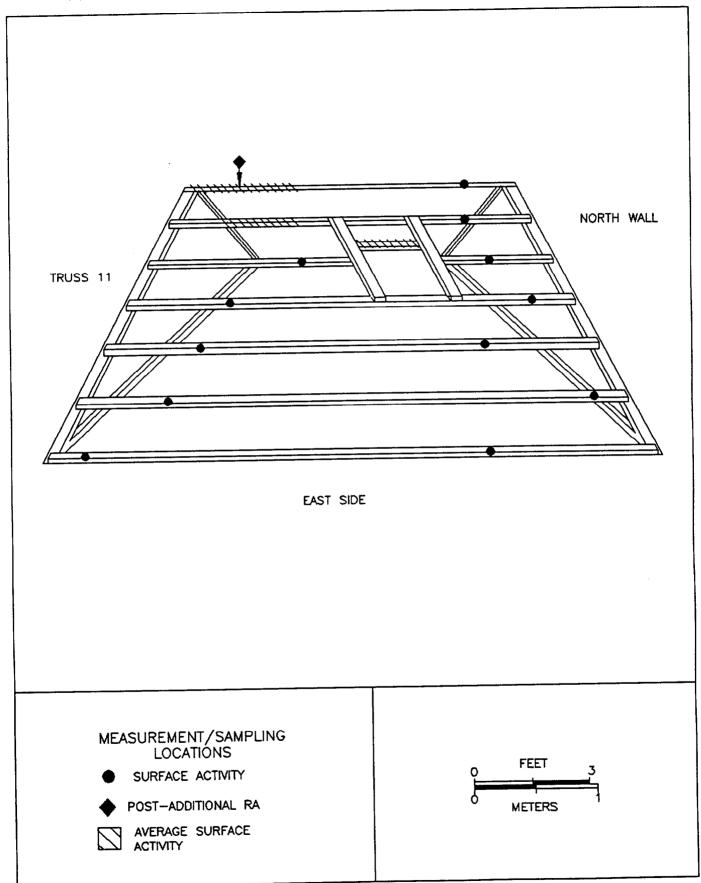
Building 3, Bay 11, East — Measurement and Sampling Locations
